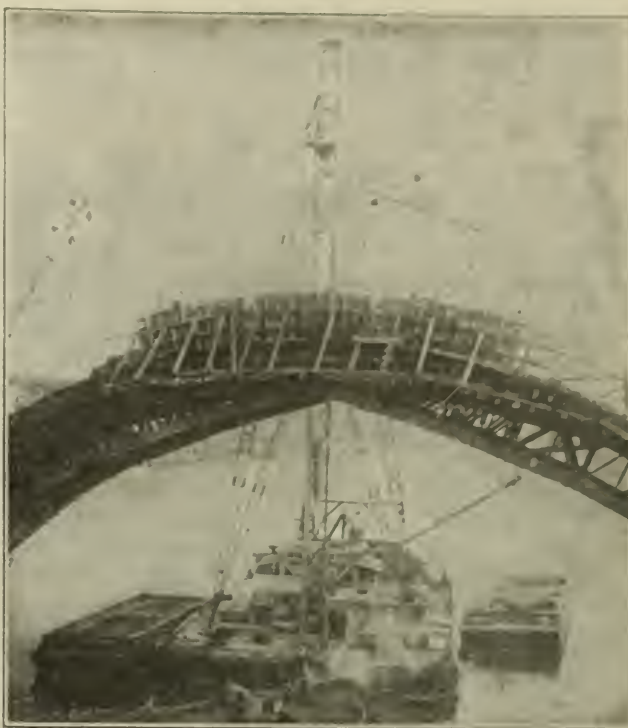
DETAILS OF FALSEWORK CENTERS FOR GEORGETOWN BRIDGE ARCHES
